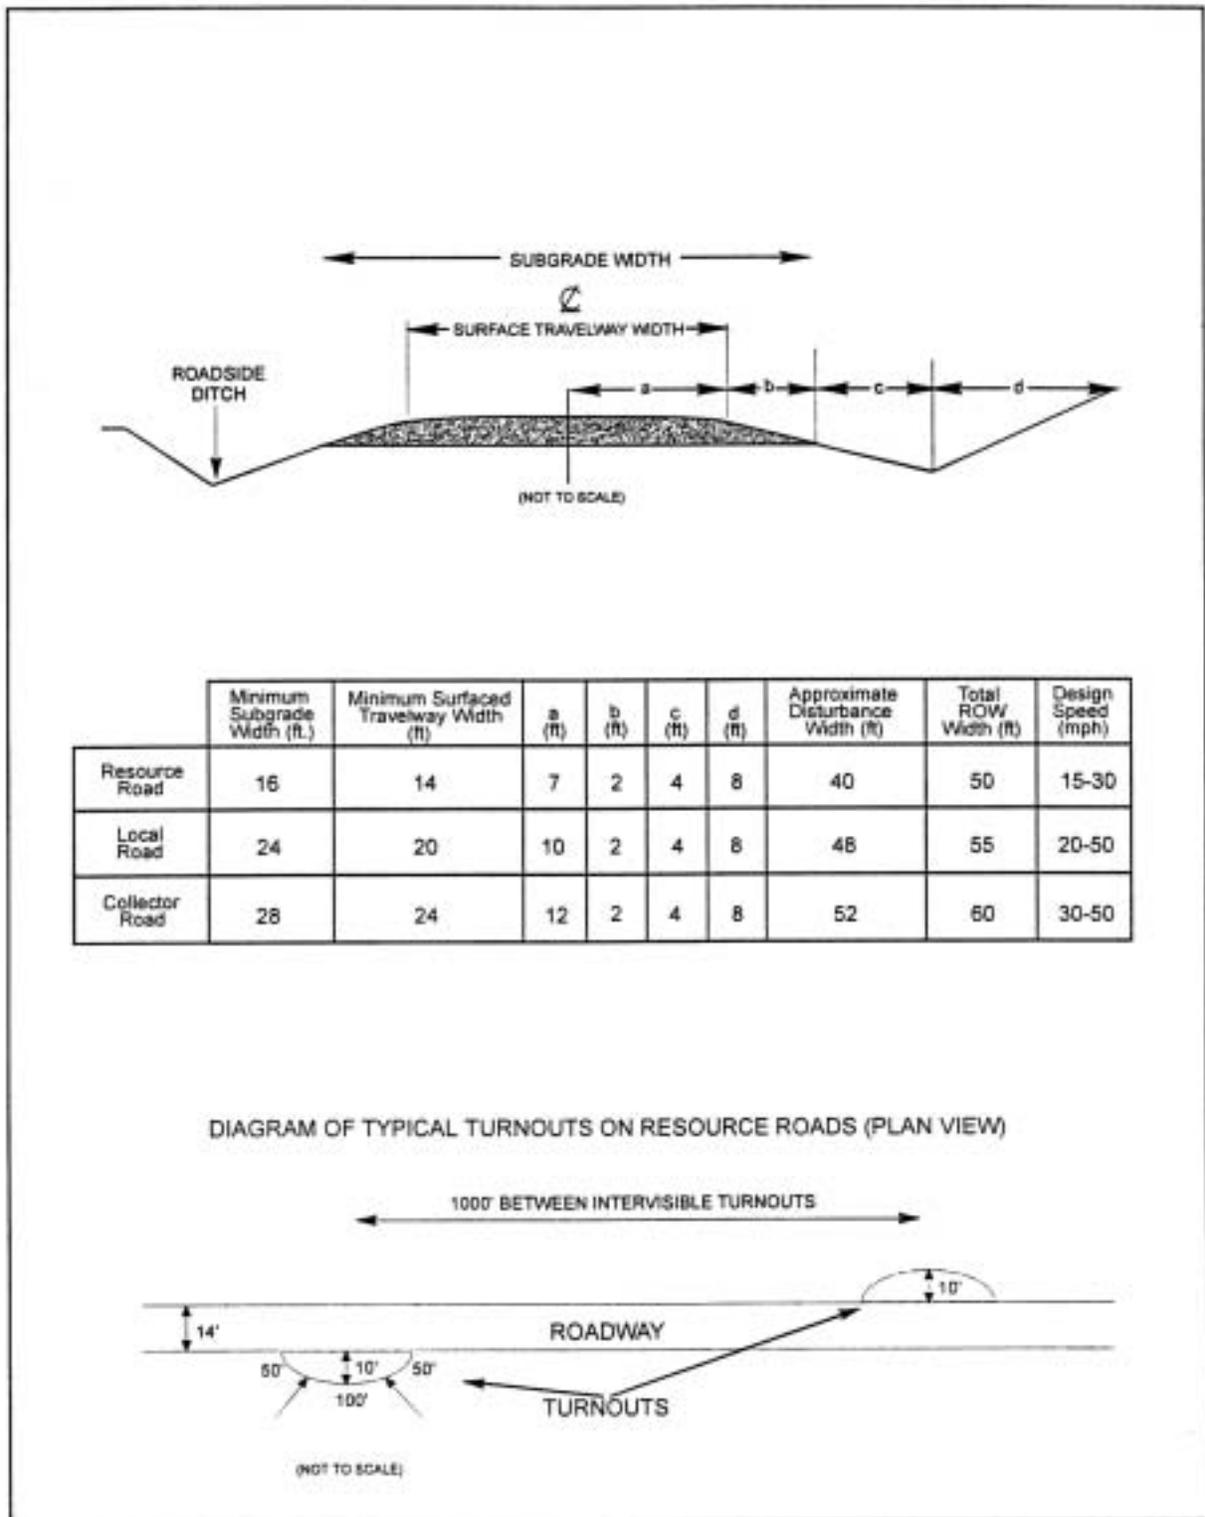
Typical Roadway Cross-Section with Width Specifications.
